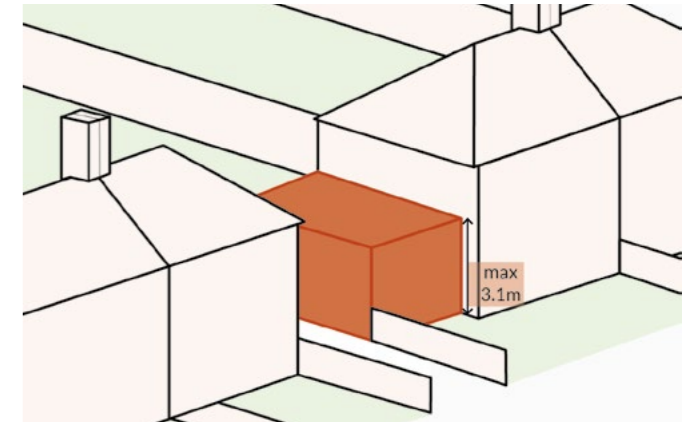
The rhythm of gaps between semi-detached homes is maintained, and the extension steps back from the original building line to remain subservient to the original dwelling
